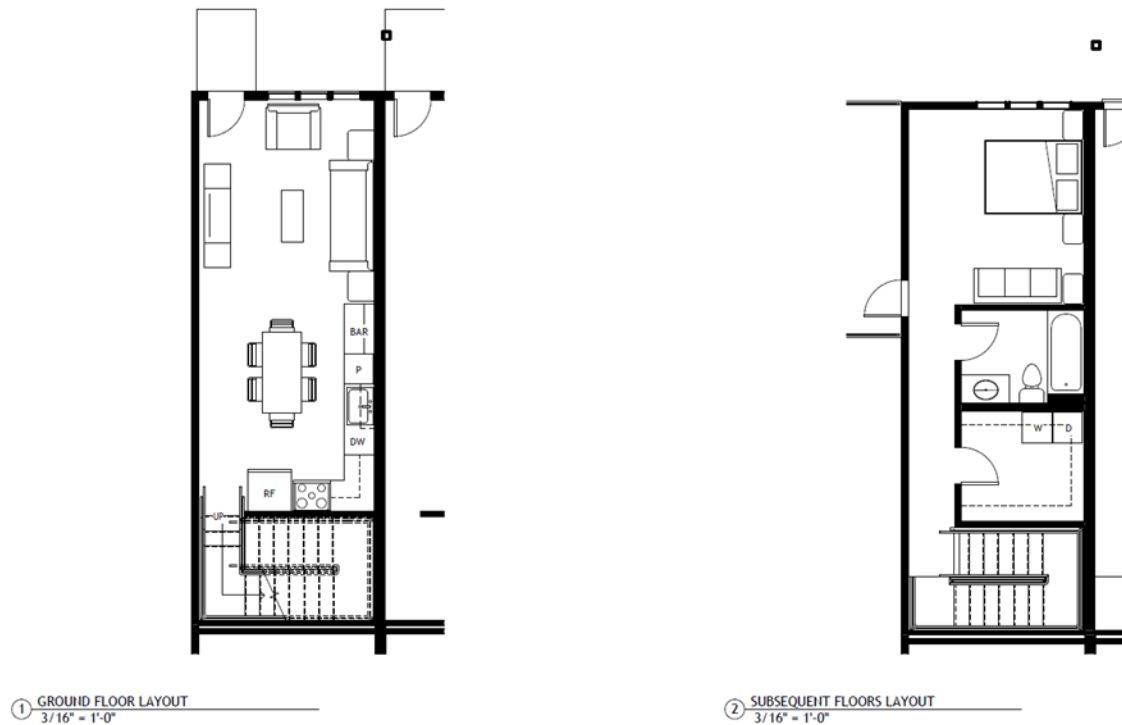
Typical townhome open floor plan with Great Room including Living, Kitchen and Dining. The typical upper floor plan at right puts living spaces in the daylit zone with bath, closet, and stairs playing supportive roles away from the daylit perimeter
